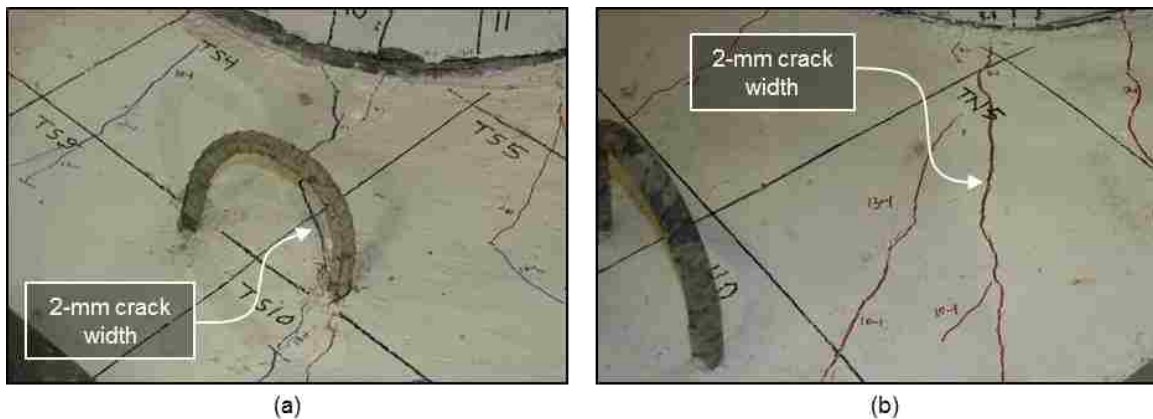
WRC cap beam cracking during the 11<sup>th</sup> cycle level (a) North side of specimen, (b) South side of specimen
